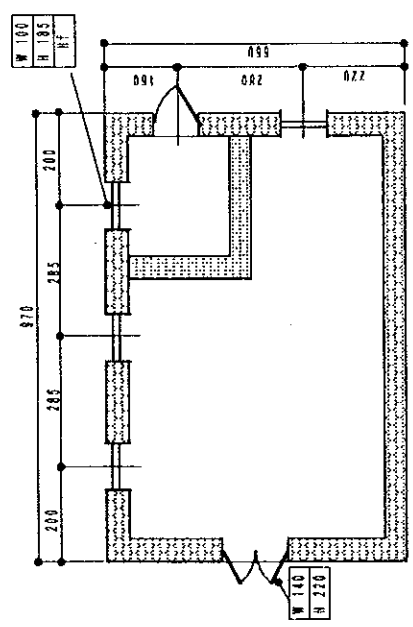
Layout Drawing of Sayhandulaaan
